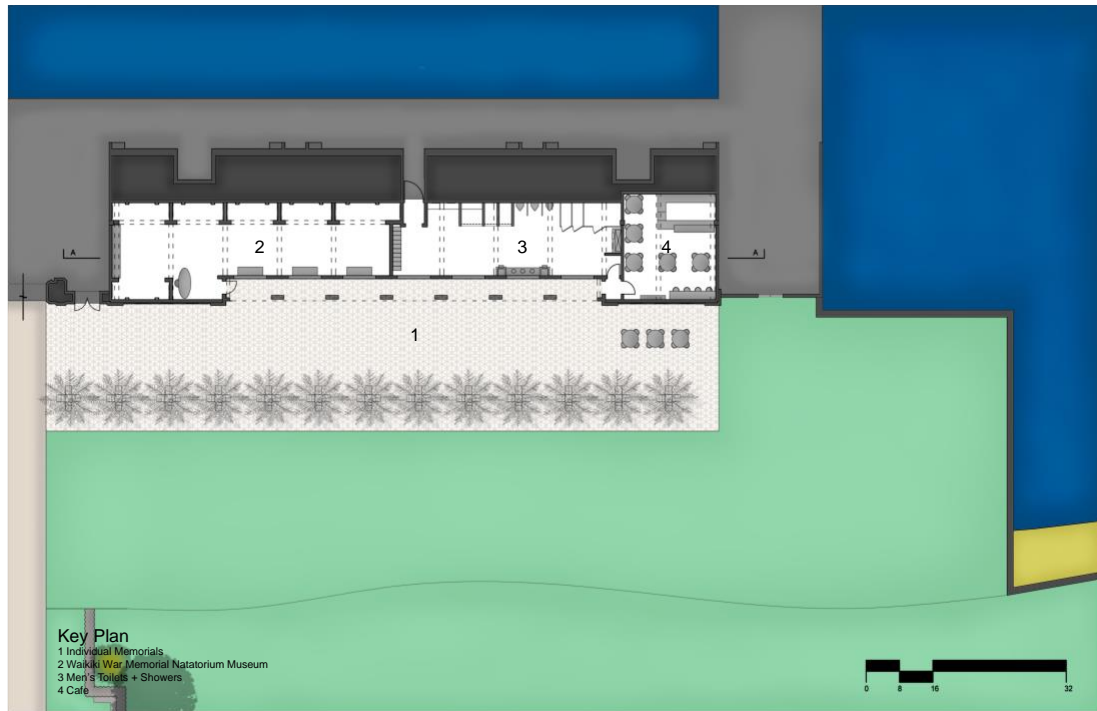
New Floor Plan of Memorial Natatorium: Ewa Side
